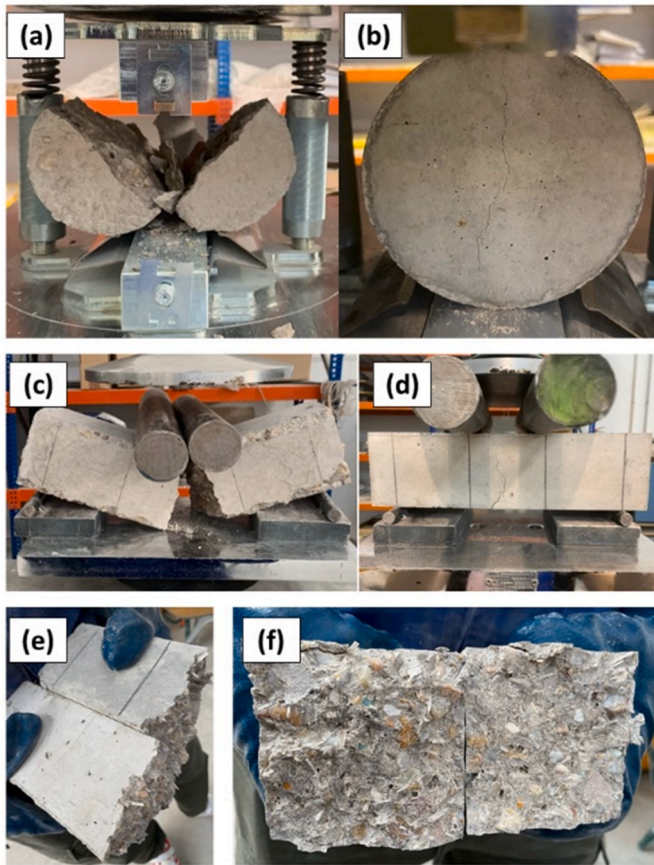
Tested specimens: (a) TSS specimen failure for the reference mix W0; (b) TSS specimen failure for mix W6; (c) FS specimen failure for mix W0; (d) FS specimen failure for mix W6; (e) specimen failure of mix W10 after FS testing and opened afterwards; (f) cross-section of a specimen of mix W10 under FS testing.
